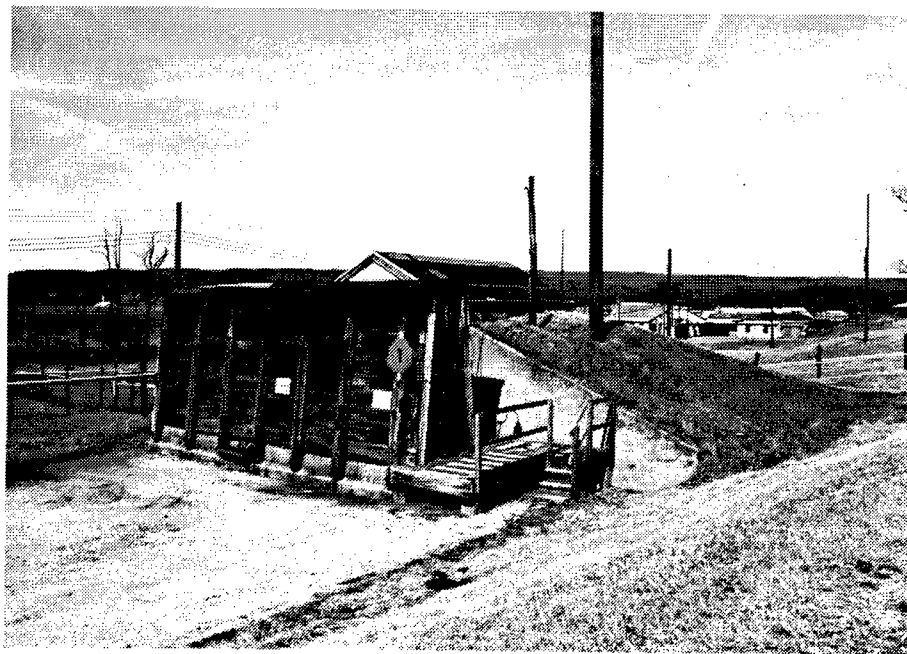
Building 7503: Magazine with an earthen barrier and earth-filled wooden barricade.
